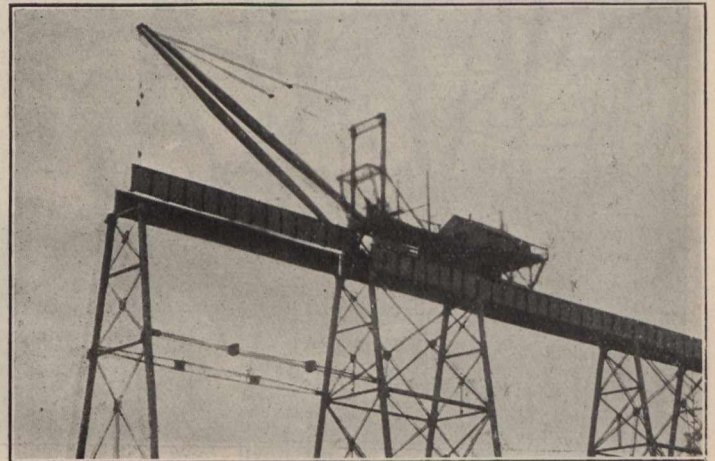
100 ft. Girder Ready to Place, Erection Struts in Position.
